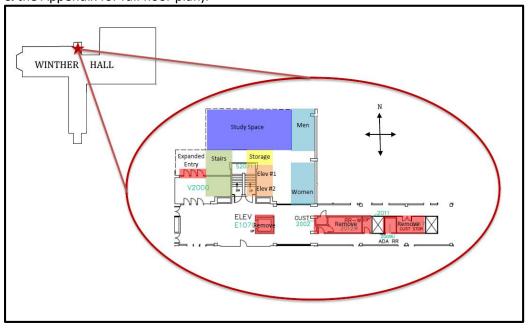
Zoomed-in View of Scenic Study View Floor Plan
